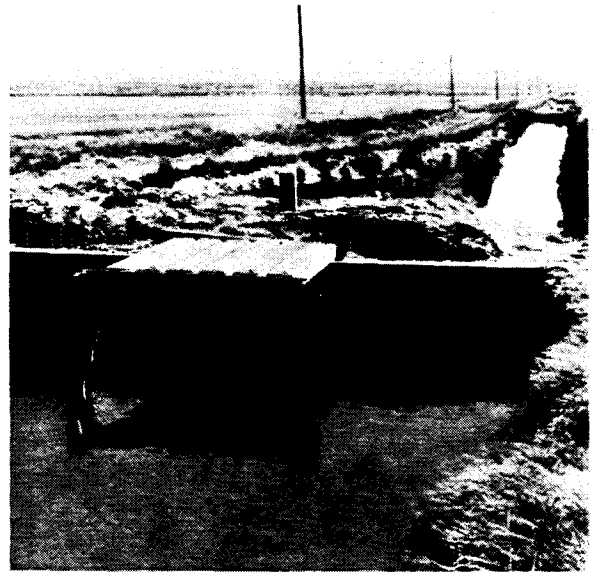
Check and pipe inlet spilling over crest. P222-116-53588
